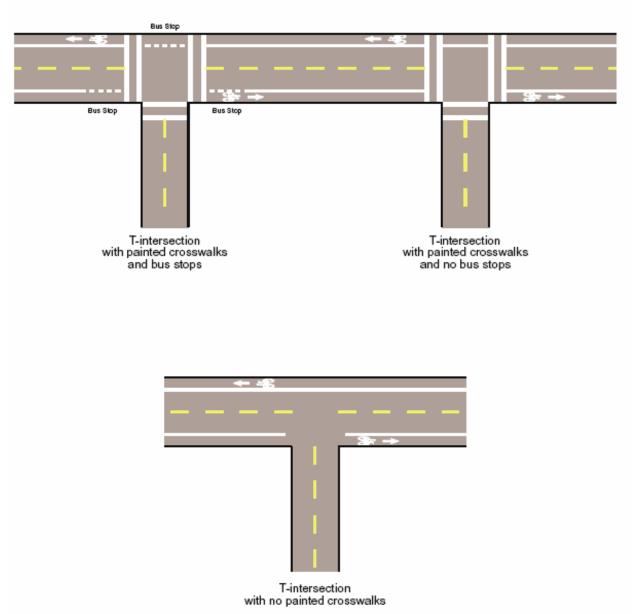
TYPICAL BIKE LANE STRIPING AT T-INTERSECTION
